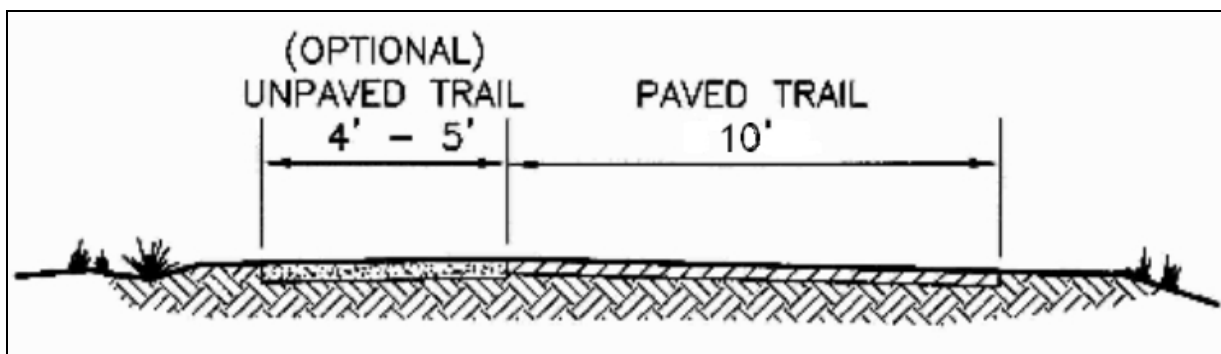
Typical Paved Multi-Use Trail Cross Section (no separation)
